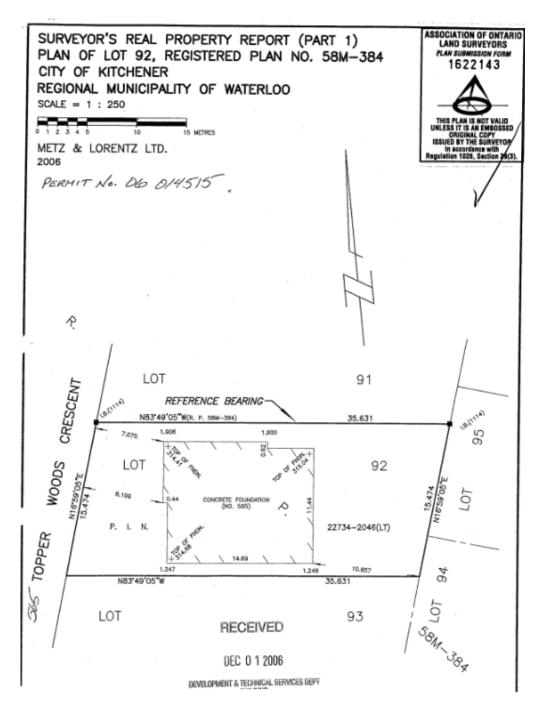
Survey plan for 565 Topper Woods Crescent.
